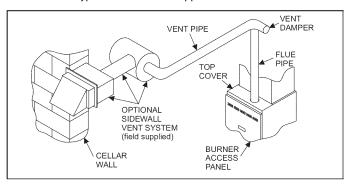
Typical Sidewall Vent and Termination Configuration
